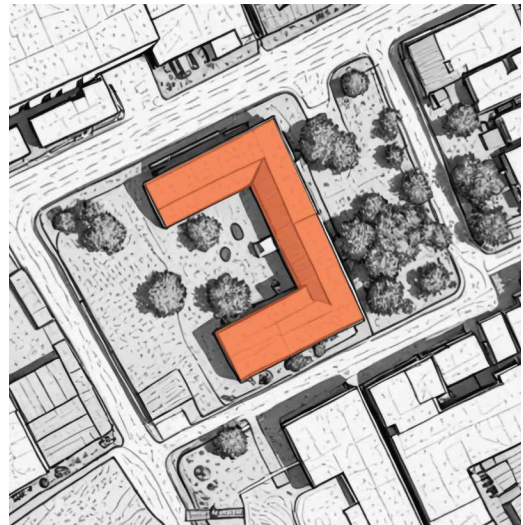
Garden Courts Girls Hostel and Surroundings: A Reconstructed Site Plan.
